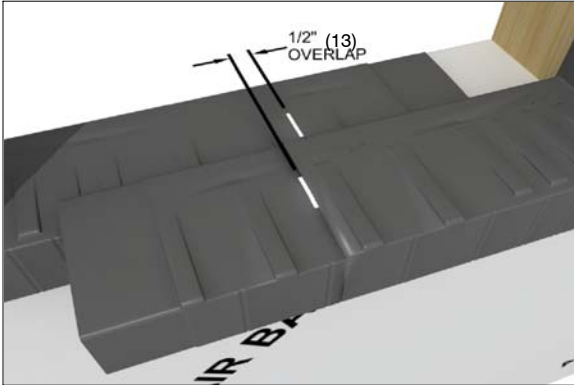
Rough openings between 13" to 20" (330-508): Cut and notch both corners. In order to obtain a proper splice joint when trimming, always cut between the ribs leaving a minimum of 1/2" (13) overlap of the drain channel. See figure 23.
